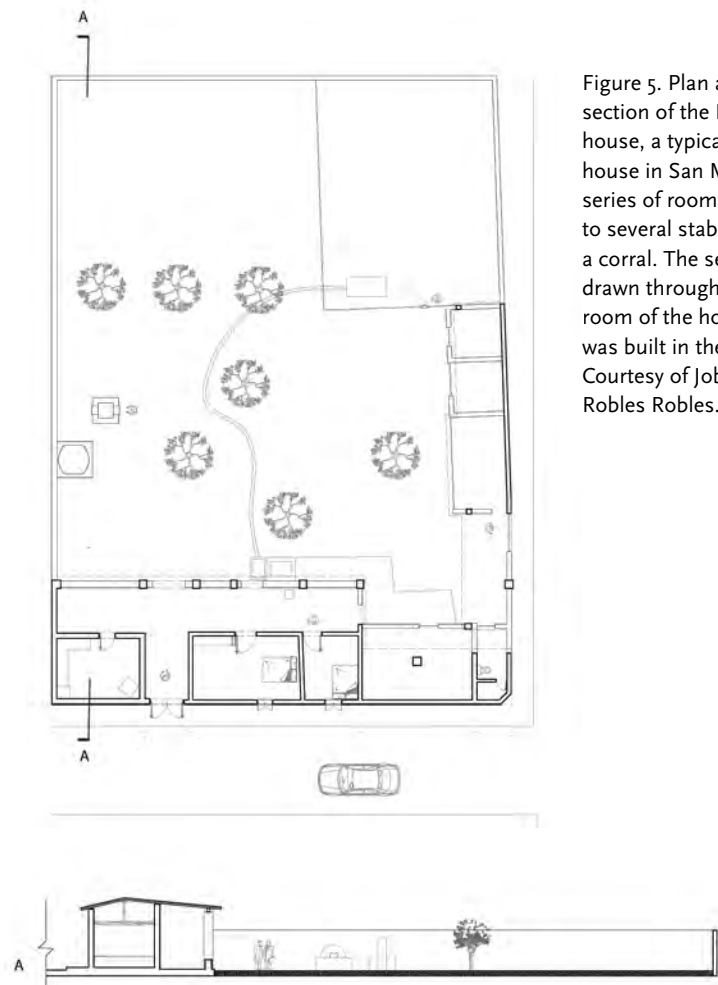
Plan and cross-section of the Rodríguez house, a typical courtyard house in San Miguel. A series of rooms connect to several stables and a corral. The section is drawn through the initial room of the house, which was built in the 1930s. Courtesy of Job Daniel Robles Robles.
